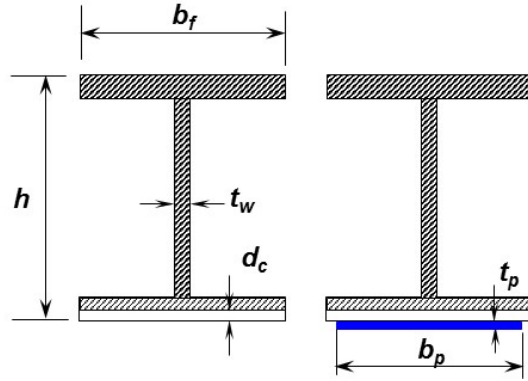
Steel beam section loss in the bottom flange and the repaired beam.
